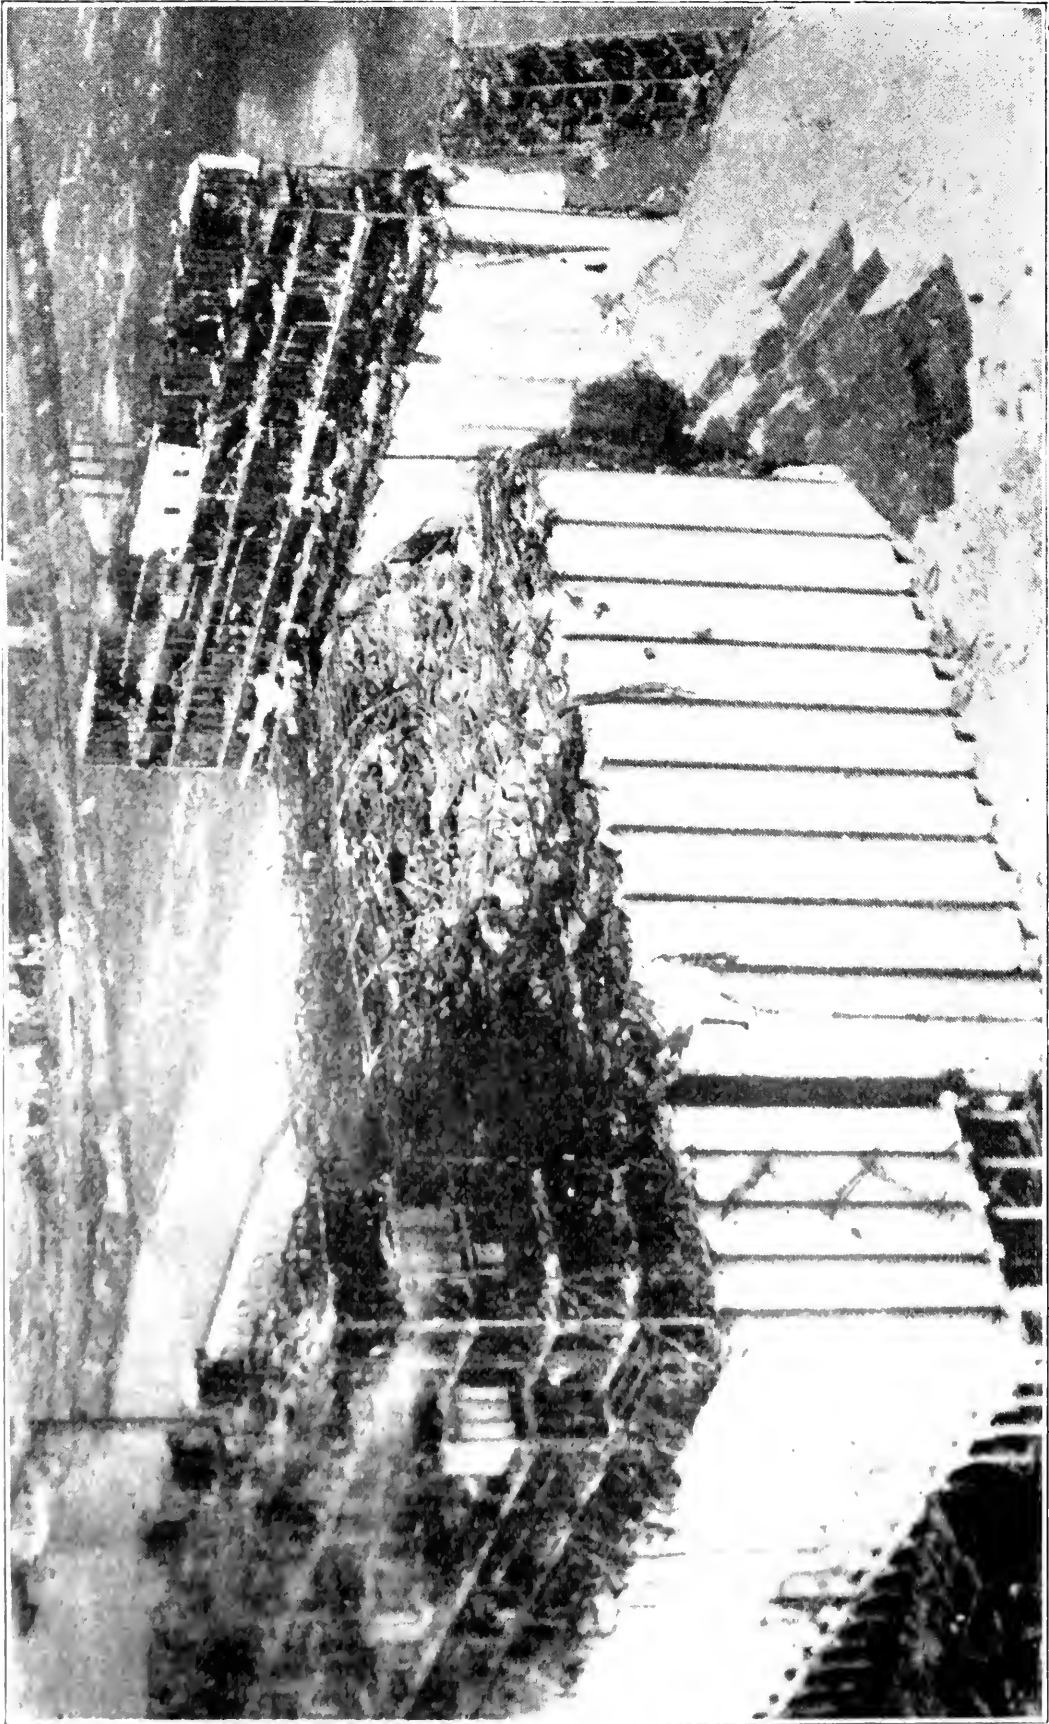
An aeroplane view taken close to the southwest corner of the work house cupola showing the damage to this section of the plant and the destruction of the steel frame work over the storage section.
